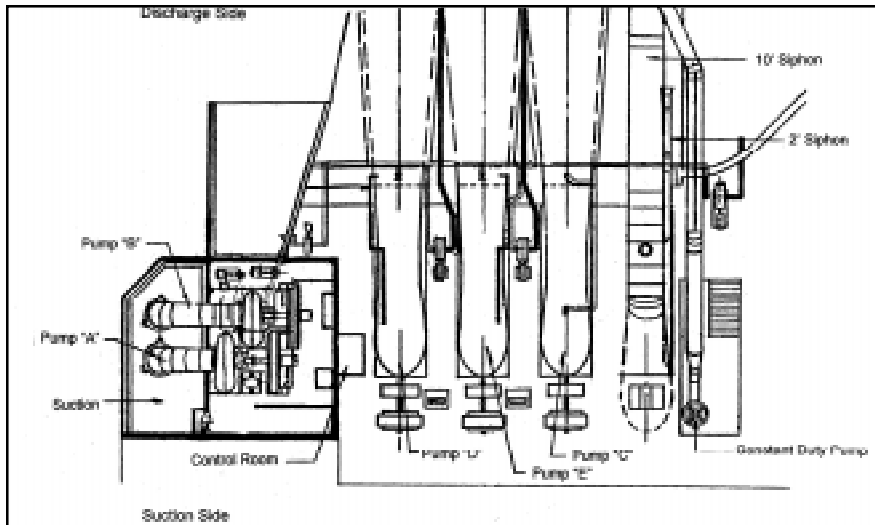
Drainage Pumping Station No. 4. Plan of existing station (NODCOE).
